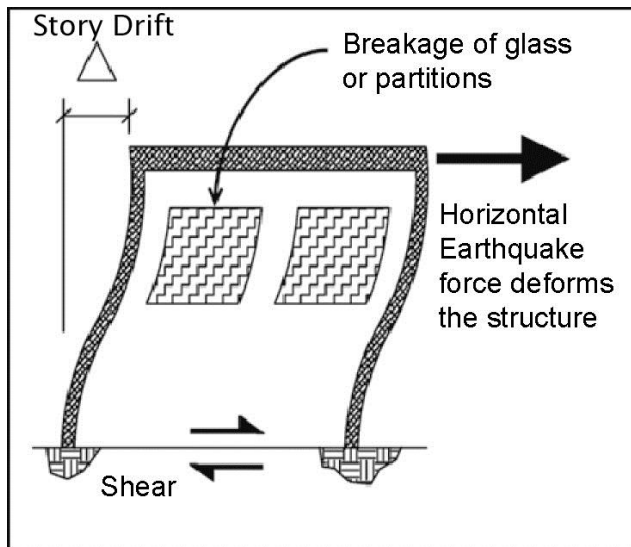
Nonstructural damage due to building deformation.
